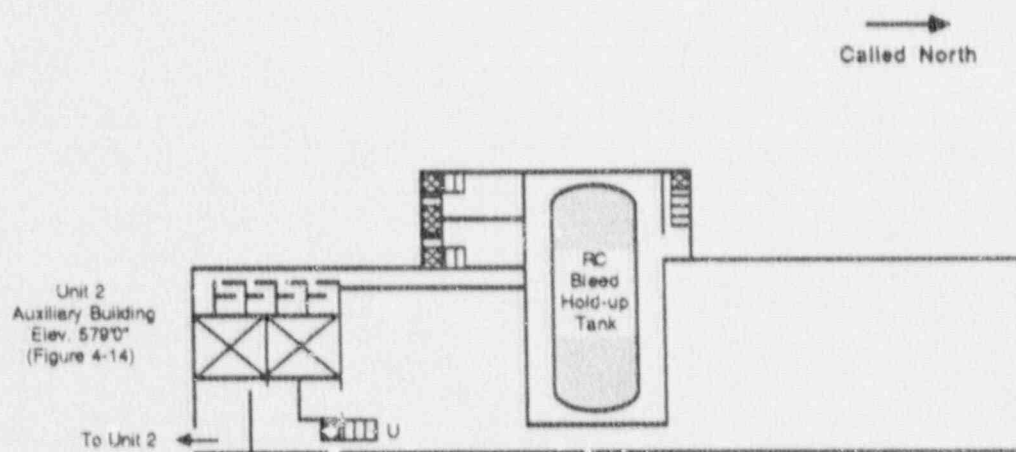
Bellefonte 1 Auxiliary Building, Elevation 579'-0"
